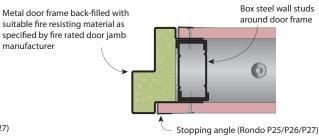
Fire Rated Metal Door Jamb Example only – Plan view
